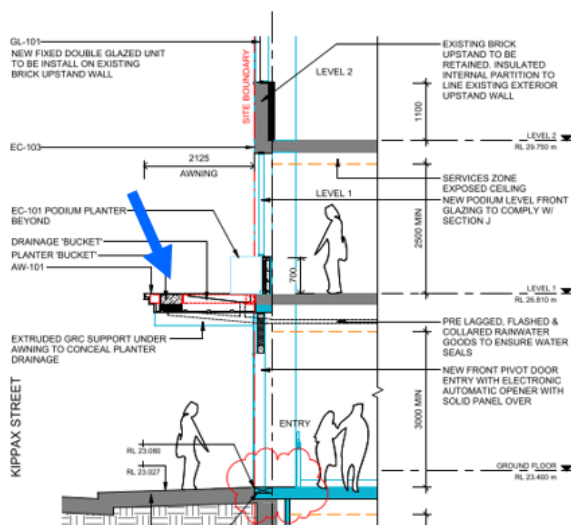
Section drawings showing projecting awning over Kippax Street. .
